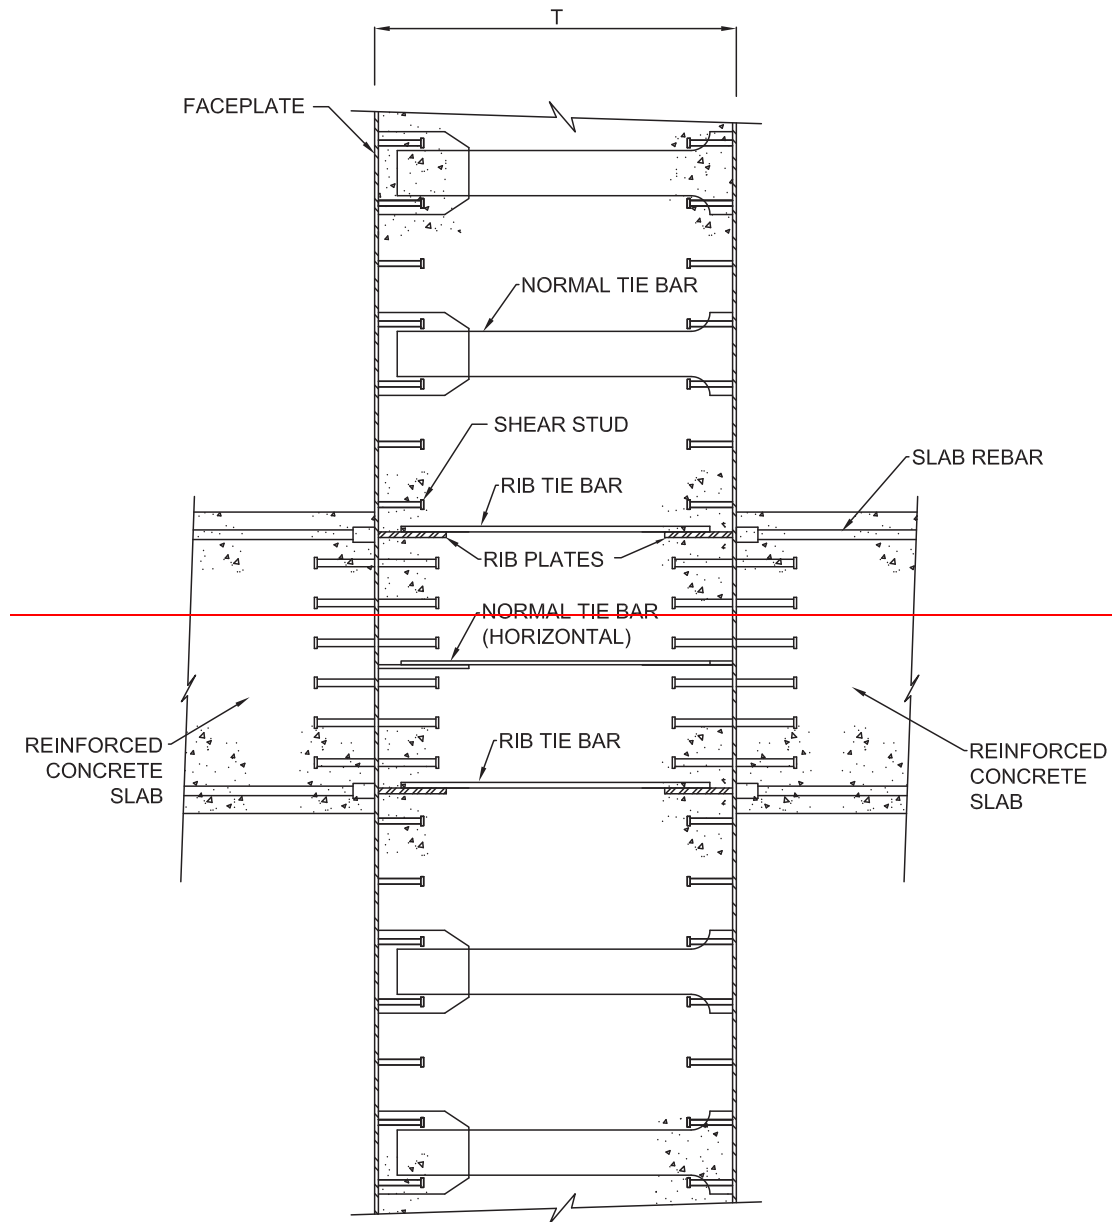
Typical Details of SC Modules (Sheet 4 of 5)
